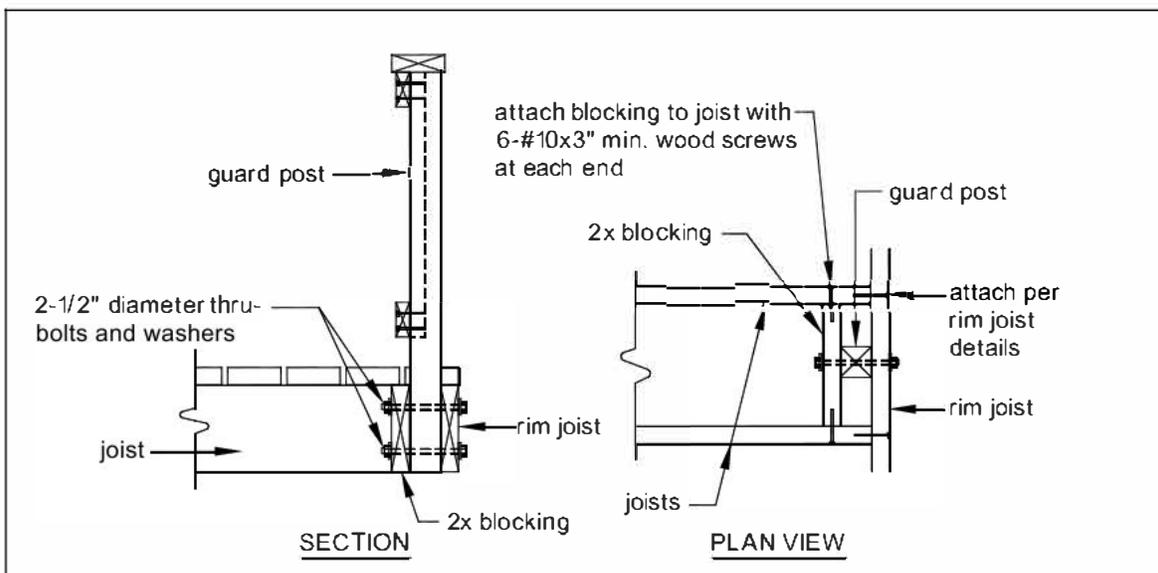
GUARD POST TO RIM JOIST DETAIL, OPTION 1
